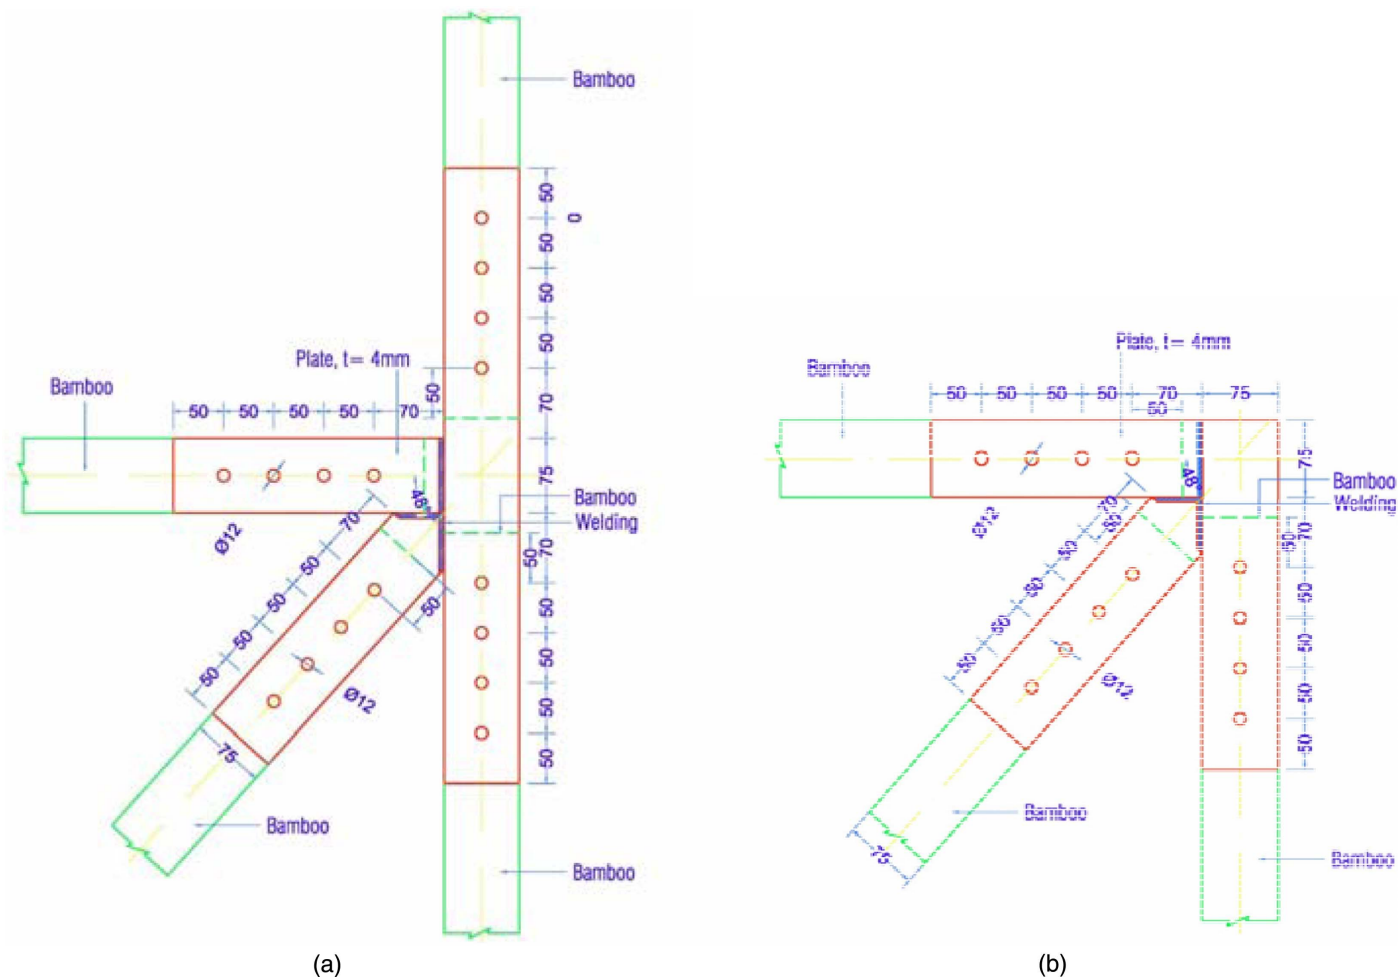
Typical schematic drawings of typical steel joints used in the tower: (a) intermediate joint; and (b) corner joint.
